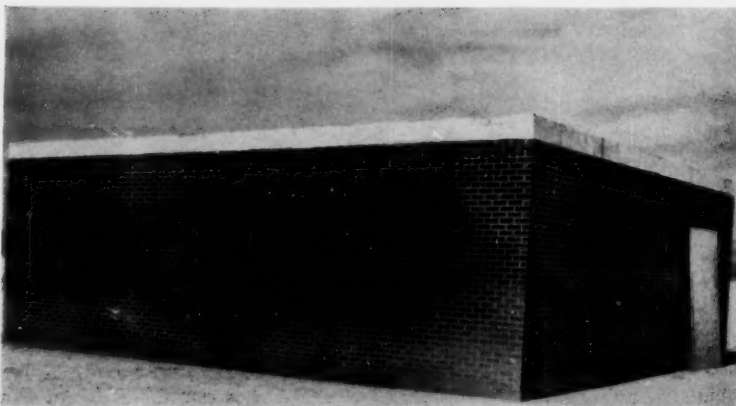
Reinforced brick masonry store in foreground was undamaged in 1954 California earthquake in which many buildings were severely damaged.
